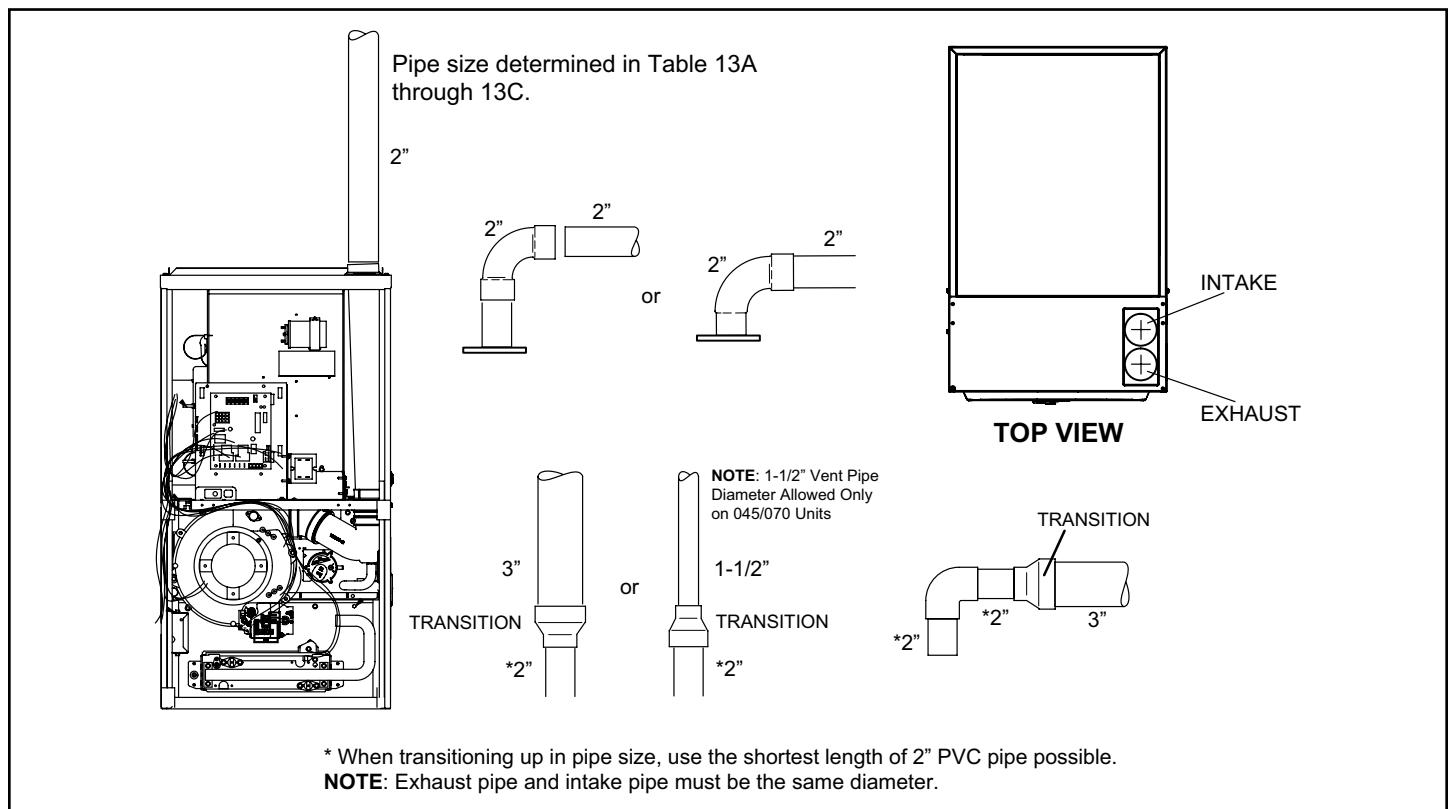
Typical Intake Pipe Connections (Direct Vent Applications)
